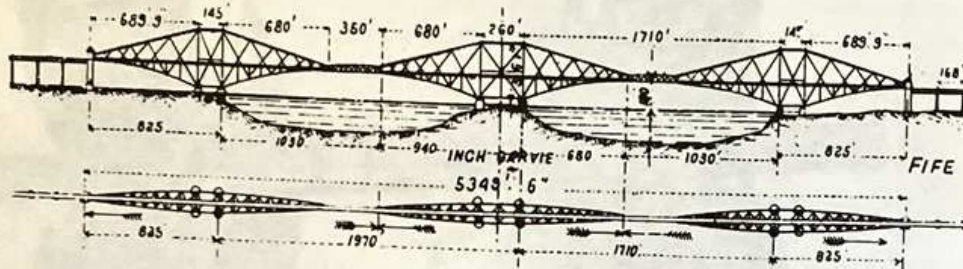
Forth Bridge Elevation and Plan with Dimensions (1)
